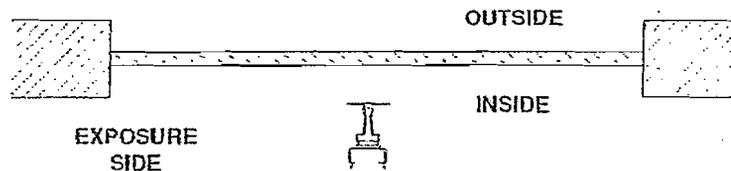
A-2 — EXTERIOR FIRE SEPARATION — SPRINKLERS INSIDE
